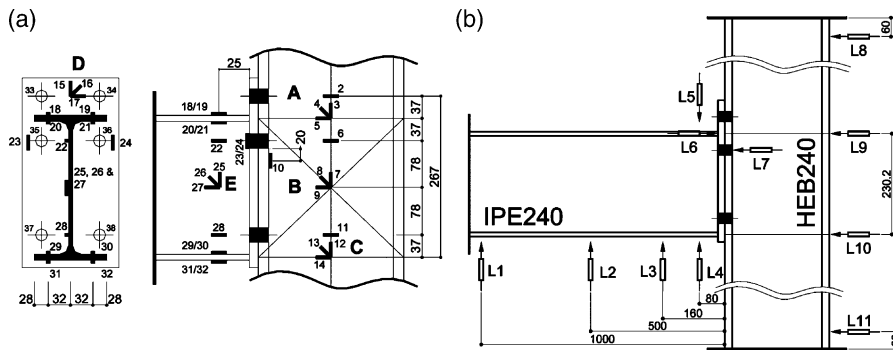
Instrumentation layout. (a) Linear strain gauges, rosettes and bolt axial strain gauges layout and (b) displacement transducers layout.
